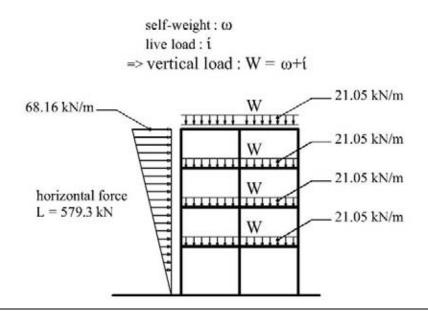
loading scheme of one single frame in sawn wood model
